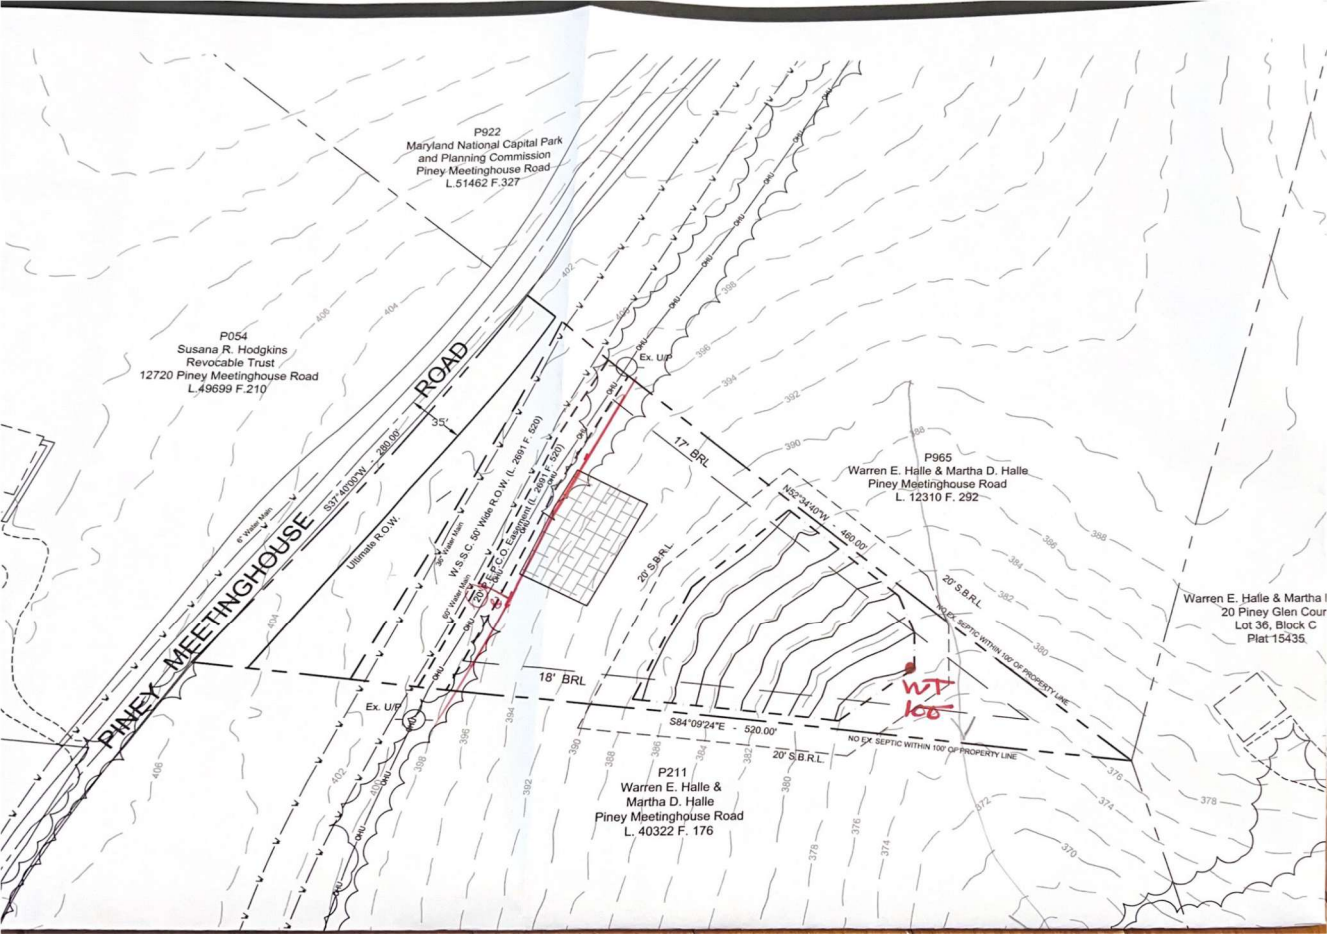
Site Plan for development of the Parcel 049 provided by the applicant.
